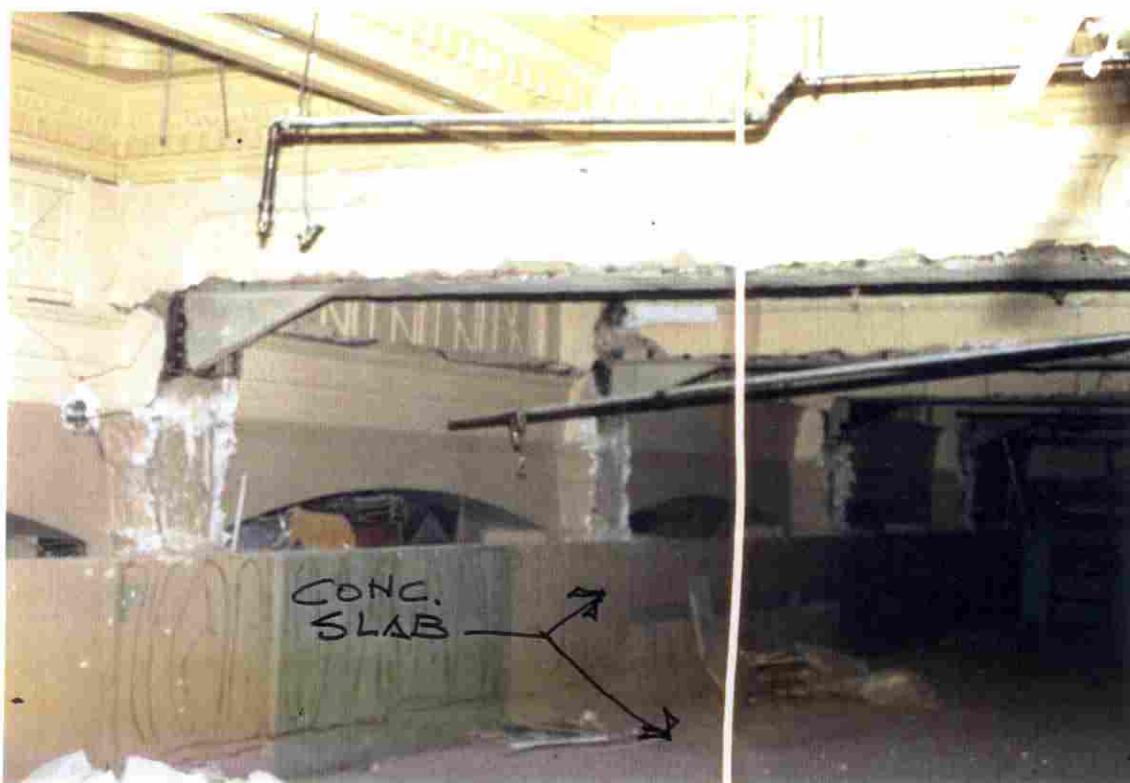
Drawing no HP-5,HP-6,HP-7
